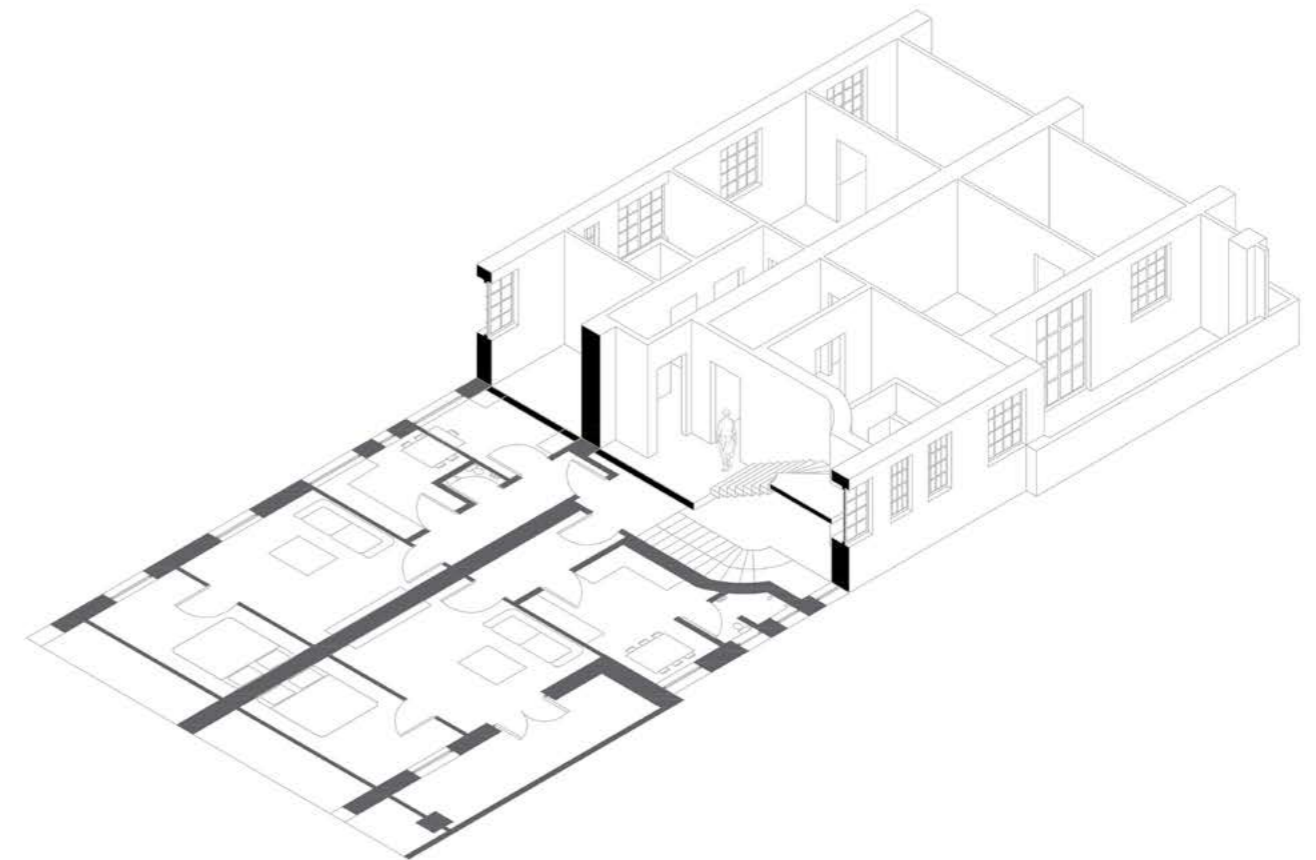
Axonometric of typical apartment located within the Vienna housing block
